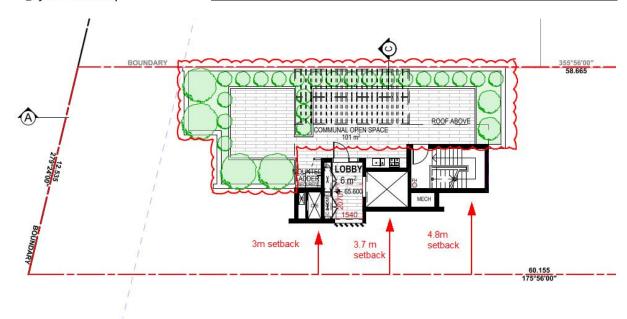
Extract of rooftop plan depicting stepped setback to east
